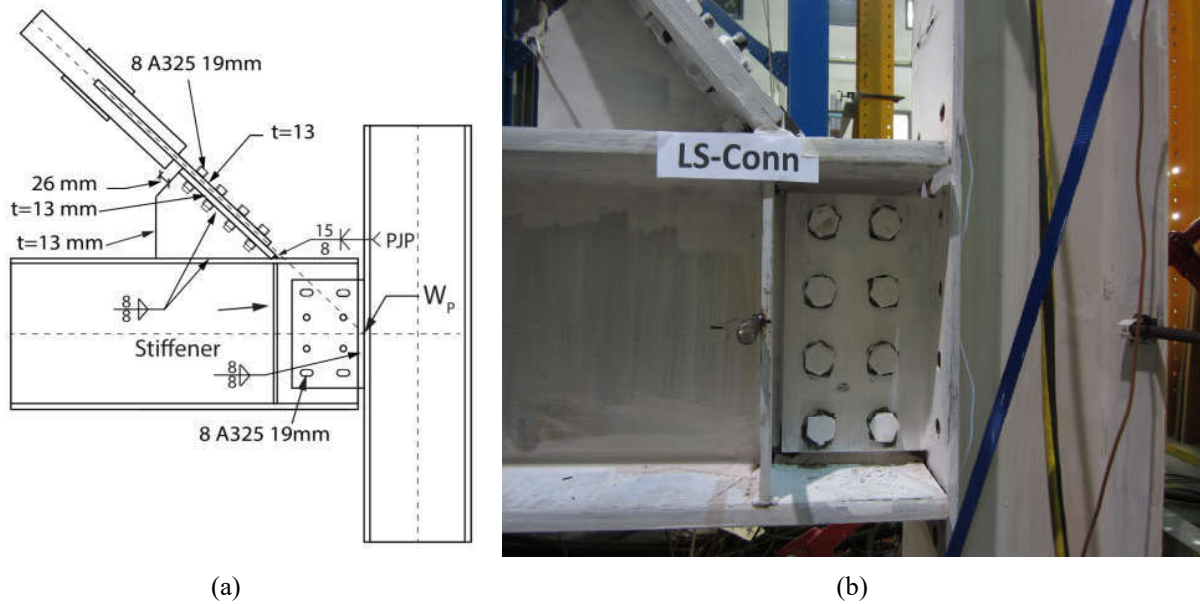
Shear tab connection (STC) (a) drawing, (b) as-built photo
